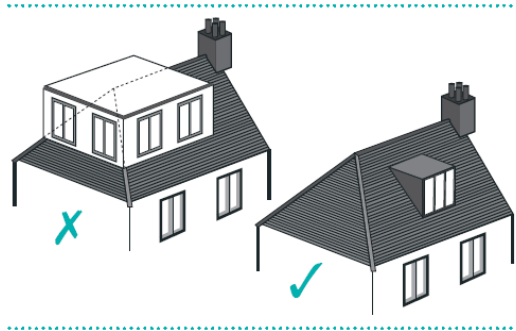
Size and scale of dormer windows. Dormers should be of an appropriate size and position
